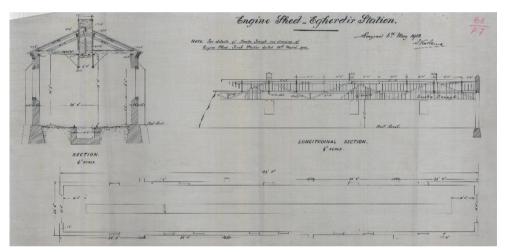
Original Drawings of Cer Building (TCDD Archive)
